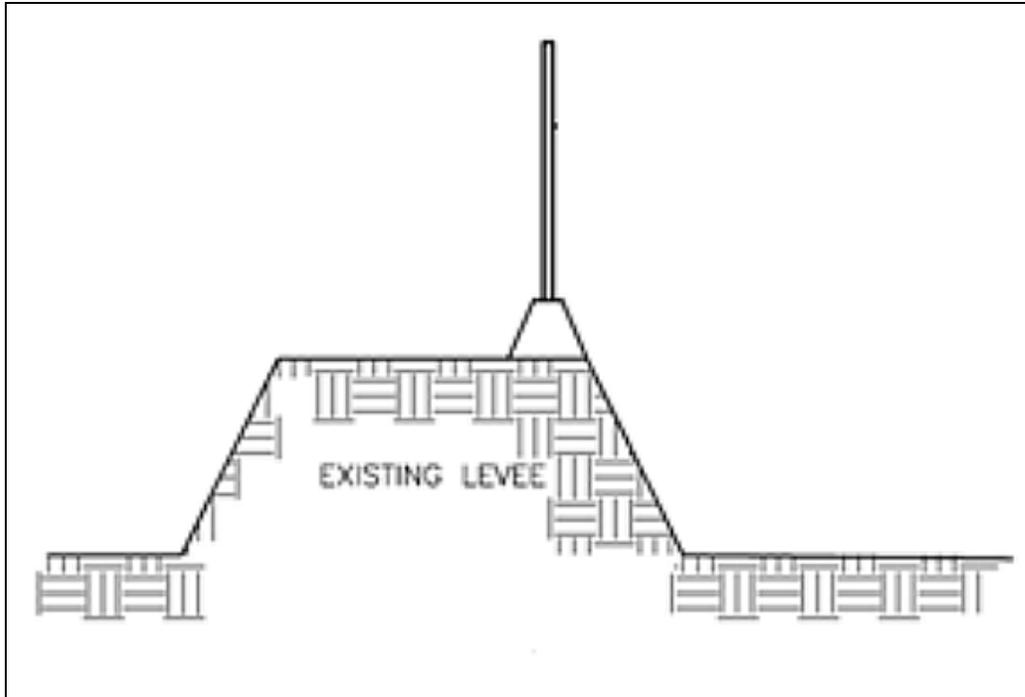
Cross Section of Typical Floating Primary Pedestrian Fence (Fence Type P-3B-15)
